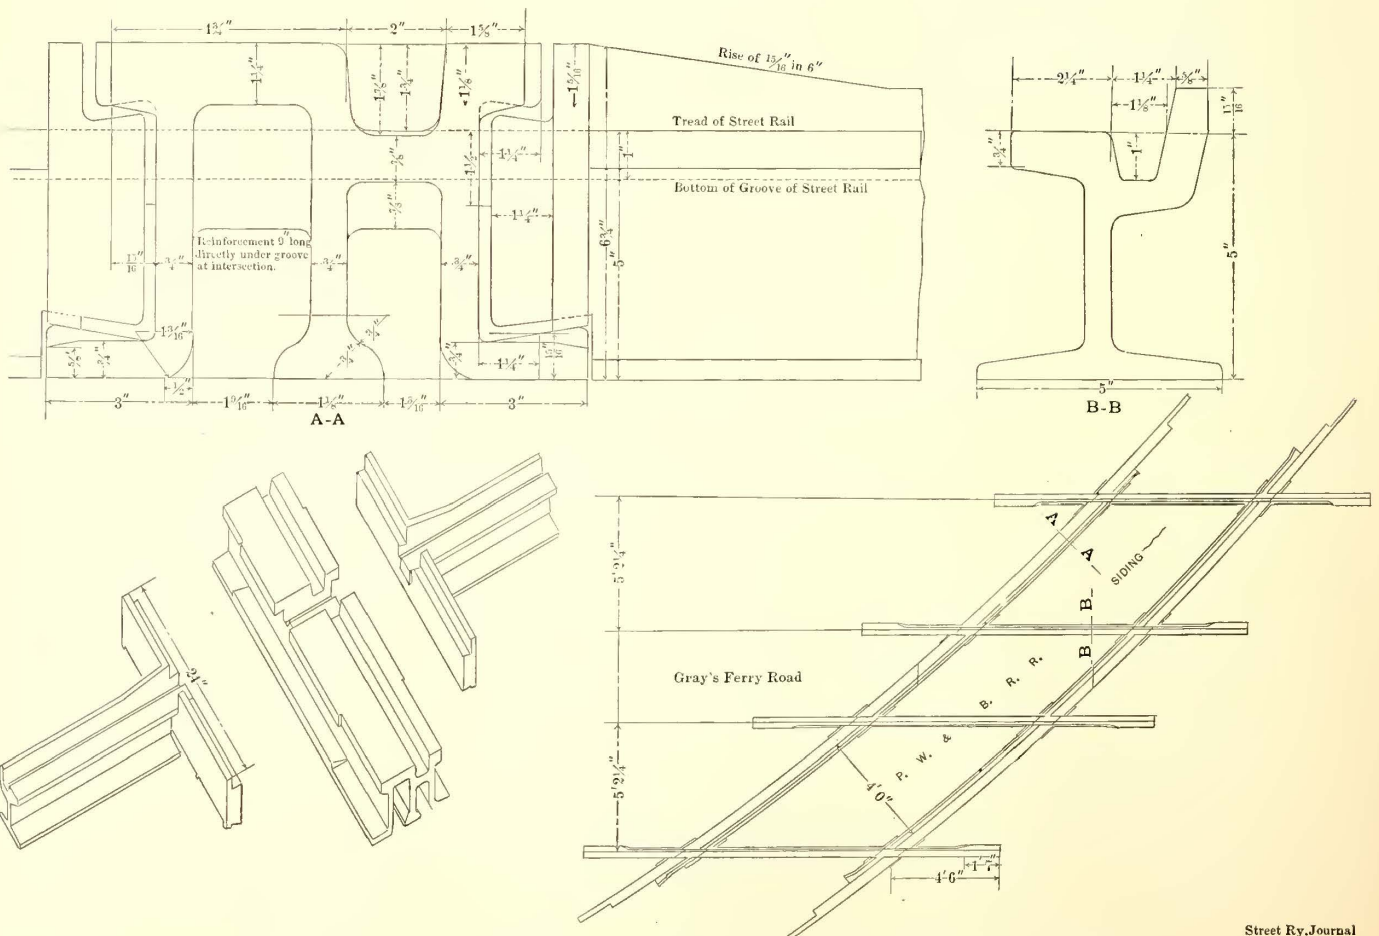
PLAN AND SECTIONS OF LATEST FORM OF STEAM RAILROAD CROSSING
